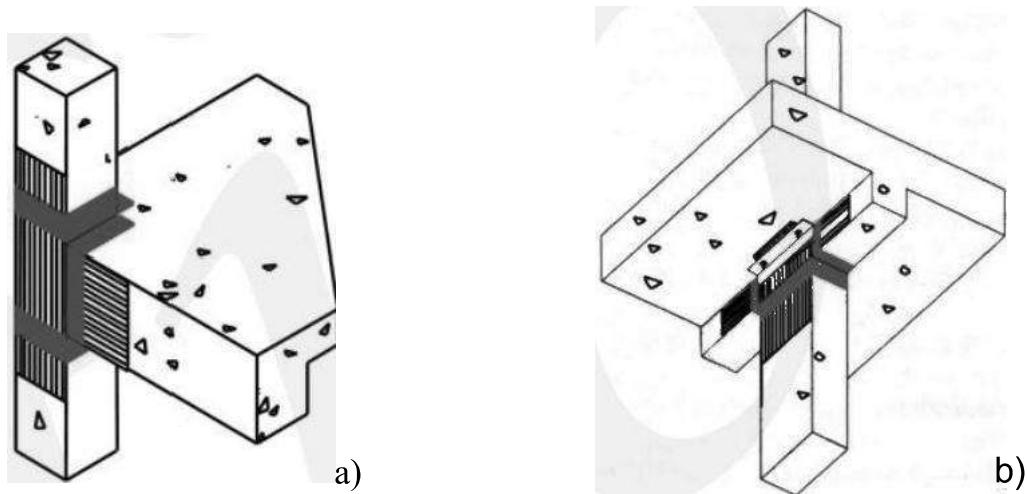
Typical configurations for shear strengthening of beam-column joints and anchorage outside the joint.
